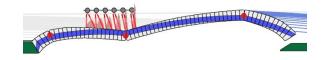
Demonstration of failure mode of span 4. Shear failure can occur as well as plastic hinges
